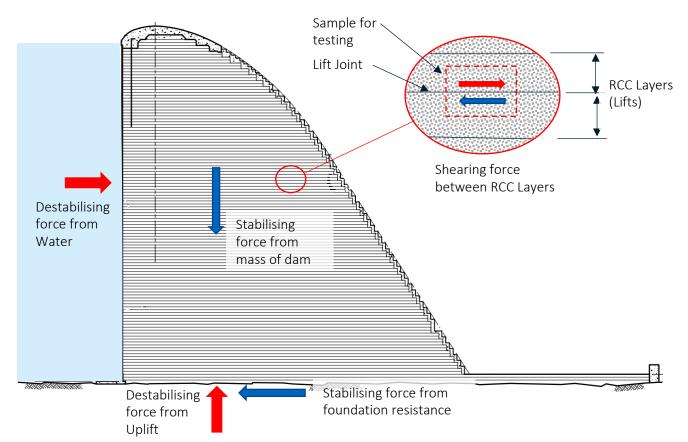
Paradise Dam Spillway Section – Depiction of how forces relate to shear strength of lift joints
